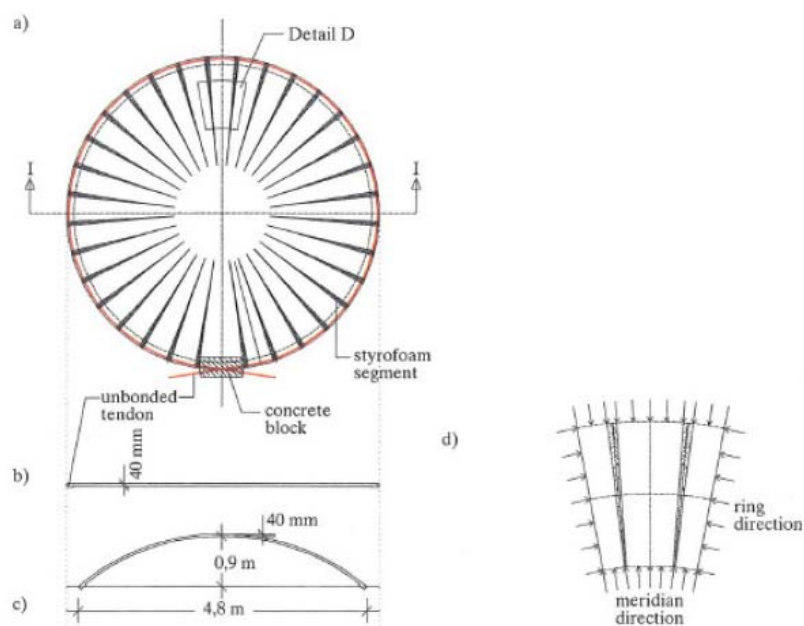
(a) Plan view of ice plate, (b) Section of ice plate, (c) Section of ice shell, (d) Detail D. (Source: [24])
